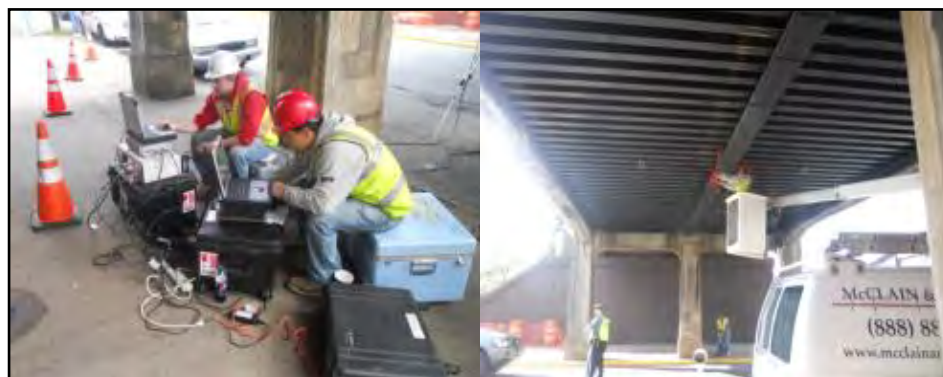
Sensor Instrumentation and Test Equipment at Bridge A
